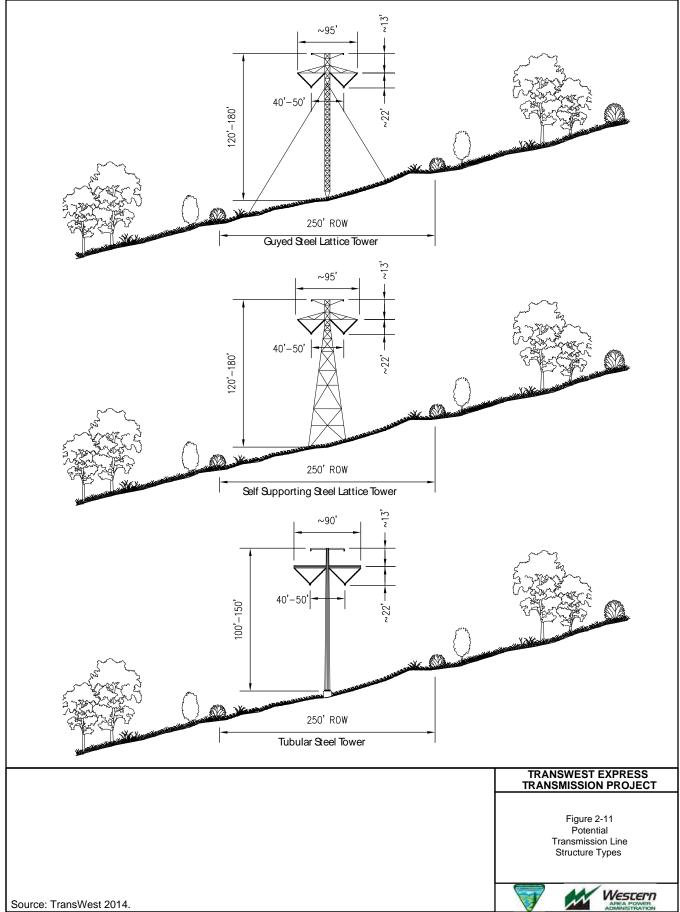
depicts the three types of transmission line structures under consideration. Foundations for guyed steel lattice towers typically would be small precast or cast-in-place concrete pedestals. The precast pedestals would be transported to the tower site on a flatbed truck and set in a small excavation dug by a backhoe or auger-type hole digger.
